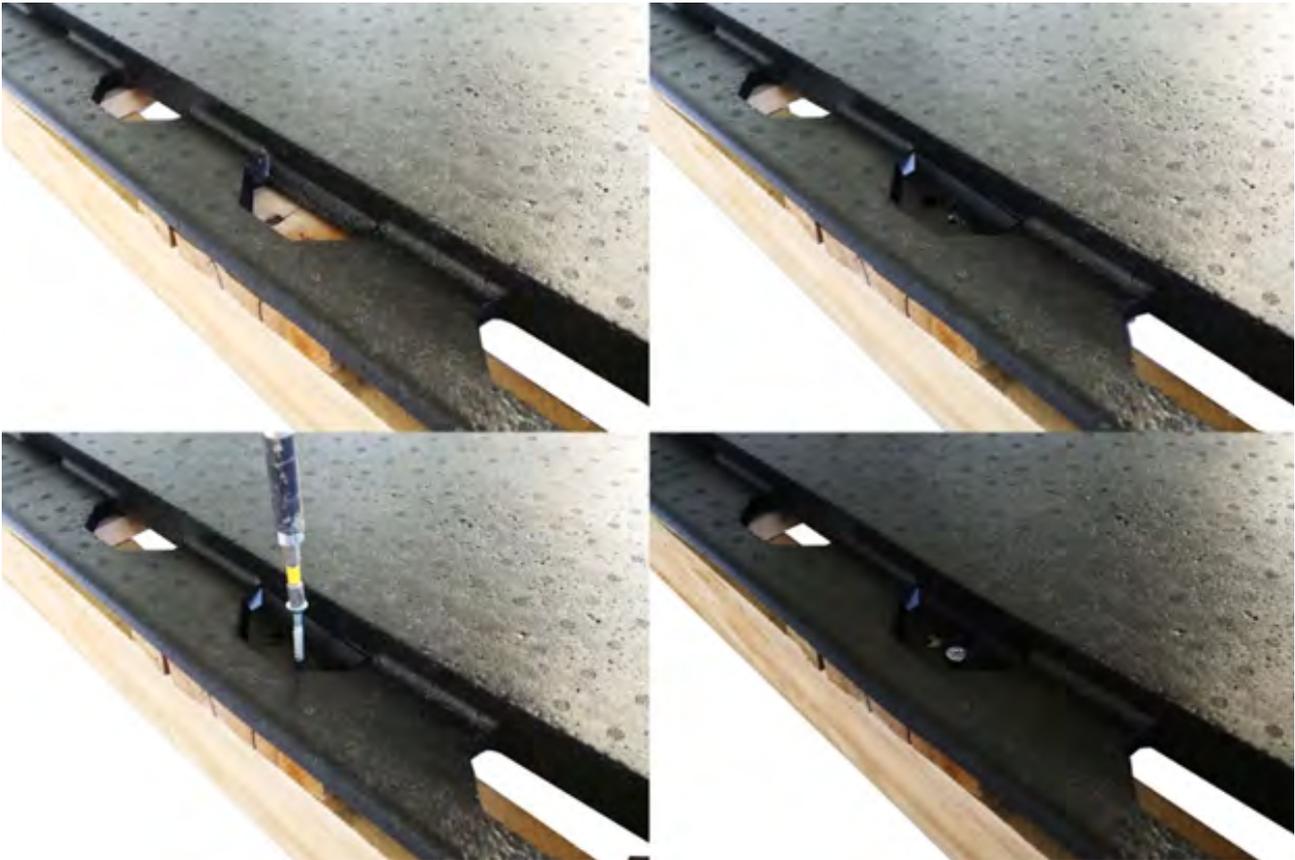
Installation of an Emergency Floor tile onto a wooden shipping pallet
